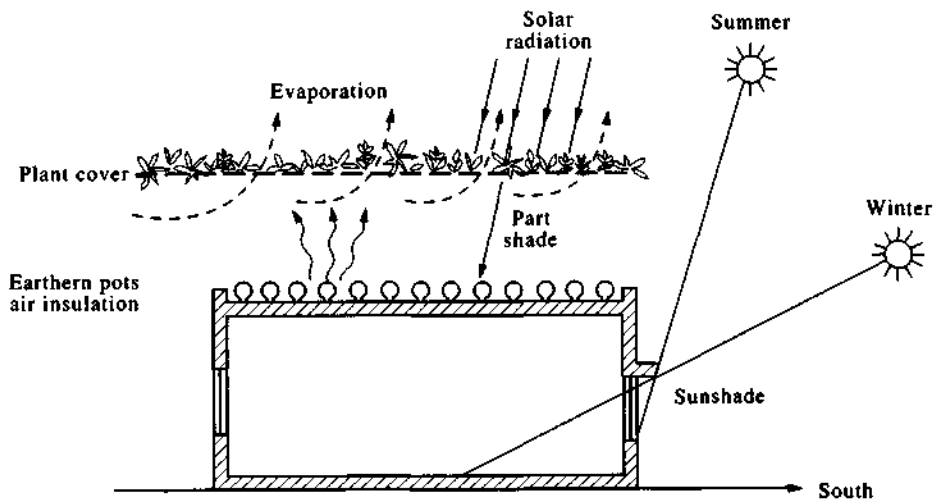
Options for passive cooling of silkworm rearing building—horizontal projection over south facing windows; roof insulation with earthen pots; and overhanging tree cover.
